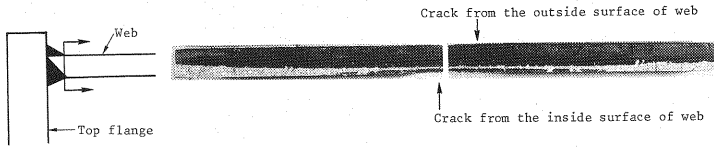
Fracture surface of Type A fatigue crack.
